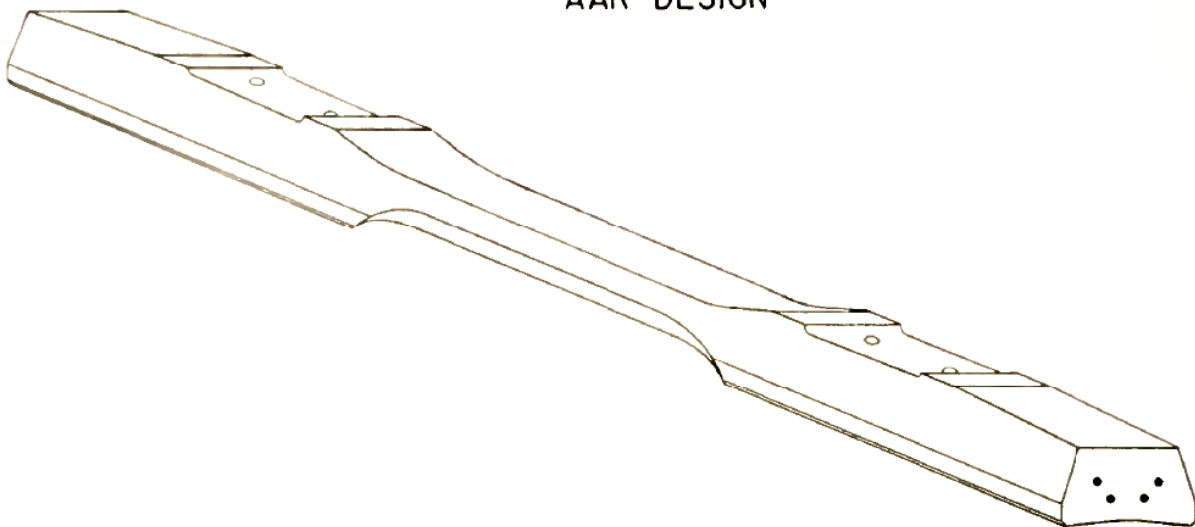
AAR Type E Concrete Tie (Magee 1966)
